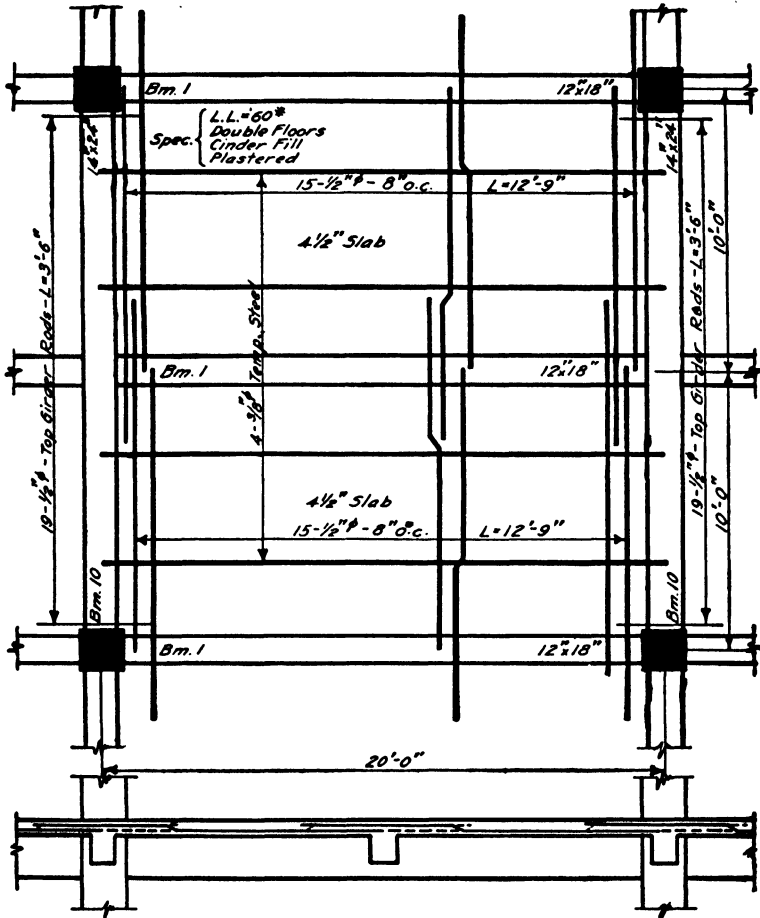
Framing for One-Way Stone Concrete Slab in Concrete Frame.
